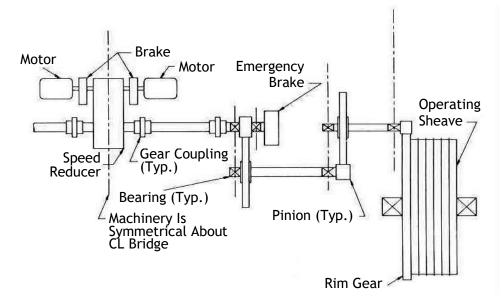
Vertical Lift Bridge Machinery is Located on the Towers, and the Rim Gears (and Operating Sheaves) are Rotated to Raise and Lower the Bridge
